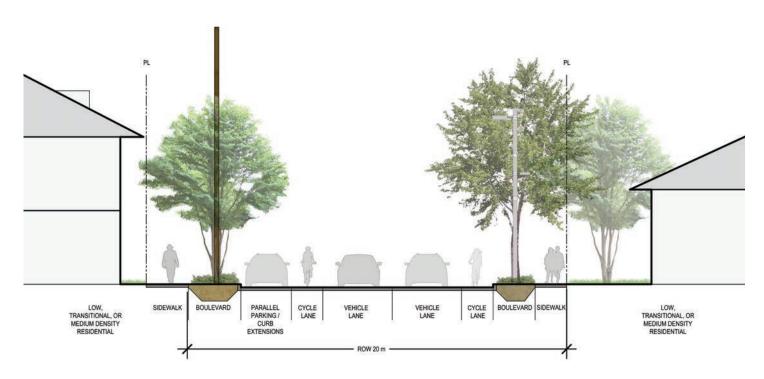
Typical Street Section for a Major Neighbourhood Connector
